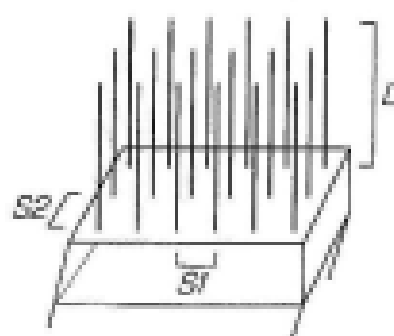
Recommended minimum lengths for grouted cablebolts
